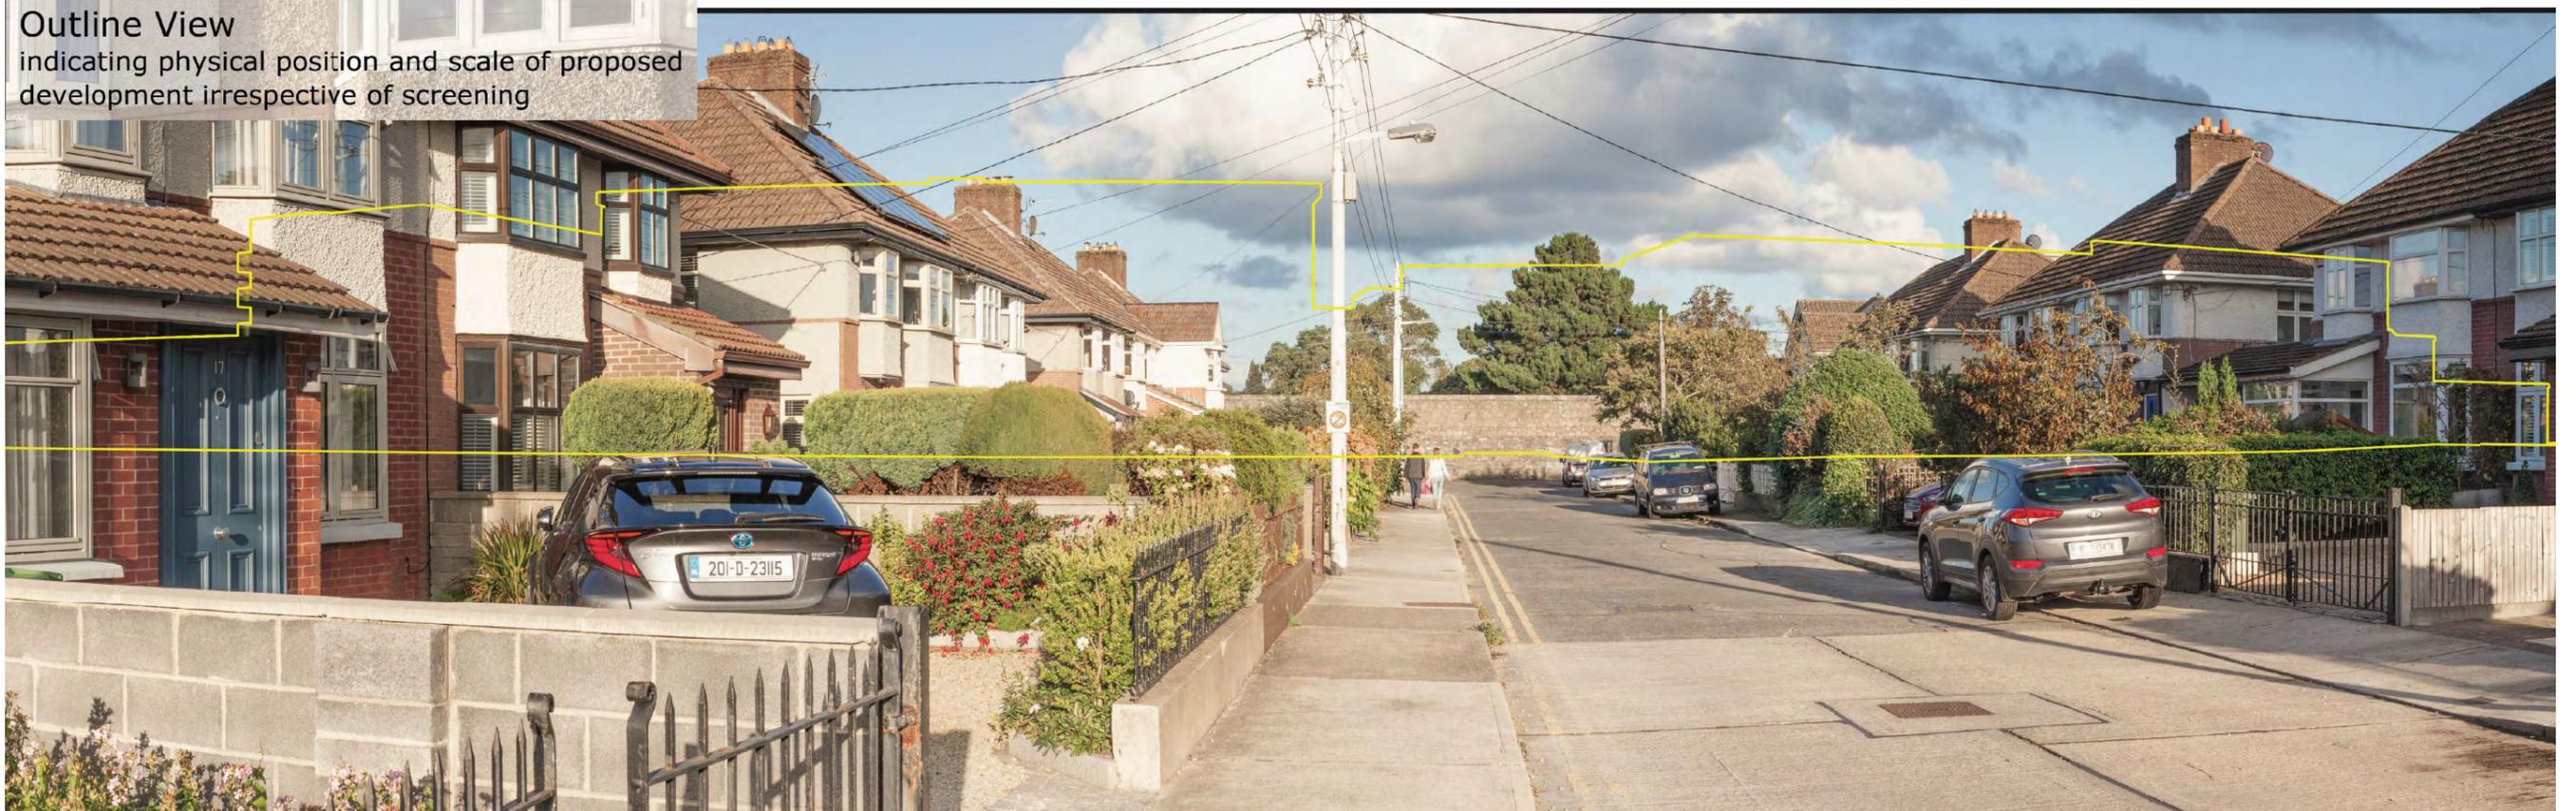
Proposed view towards site from Annaville Park (VP10)
